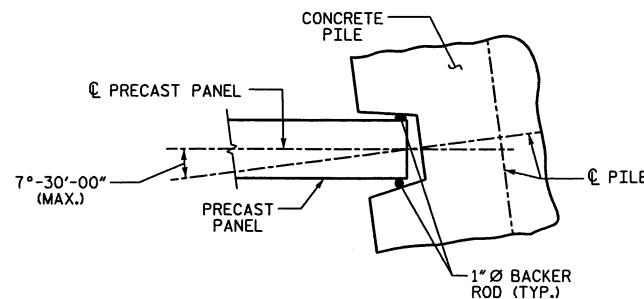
(DETAIL APPLIES TO 15' PILE SPACING ONLY.
